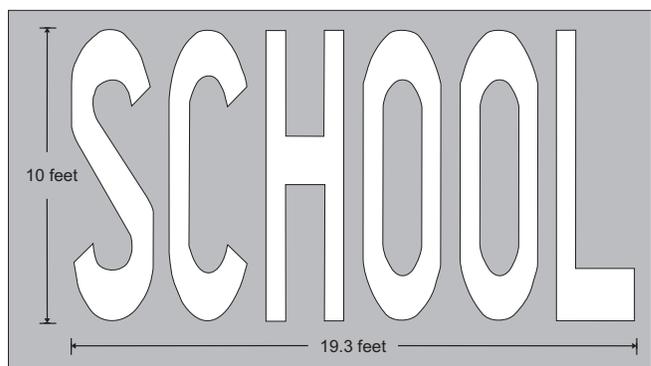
C-1. Two-Lane Pavement Marking of "SCHOOL"
